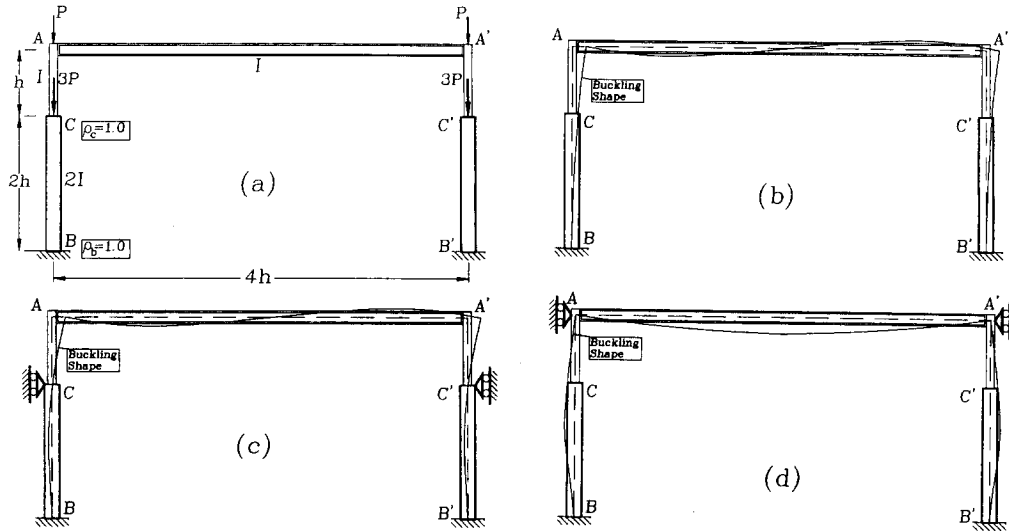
Example 5: Minimum lateral bracings for a simple bent frame with stepped columns
